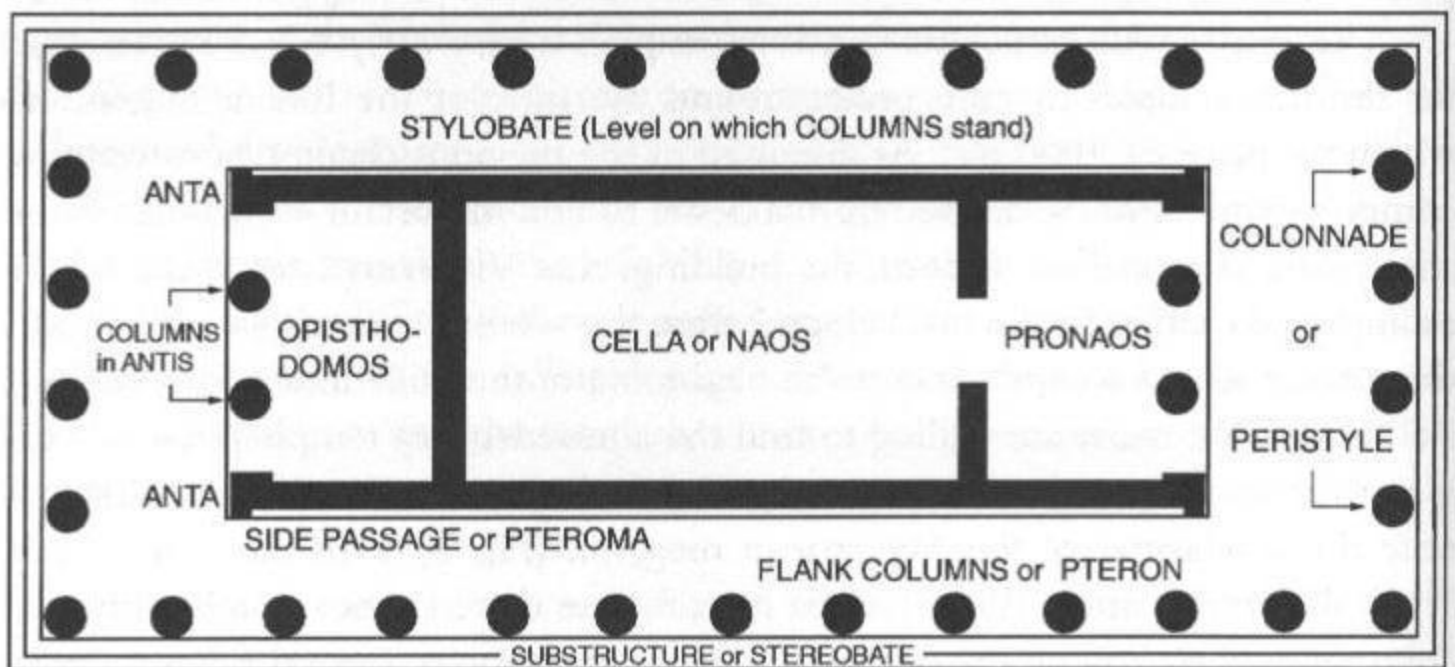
Typical Greek temple plan, drawn by Brian Slawson.
